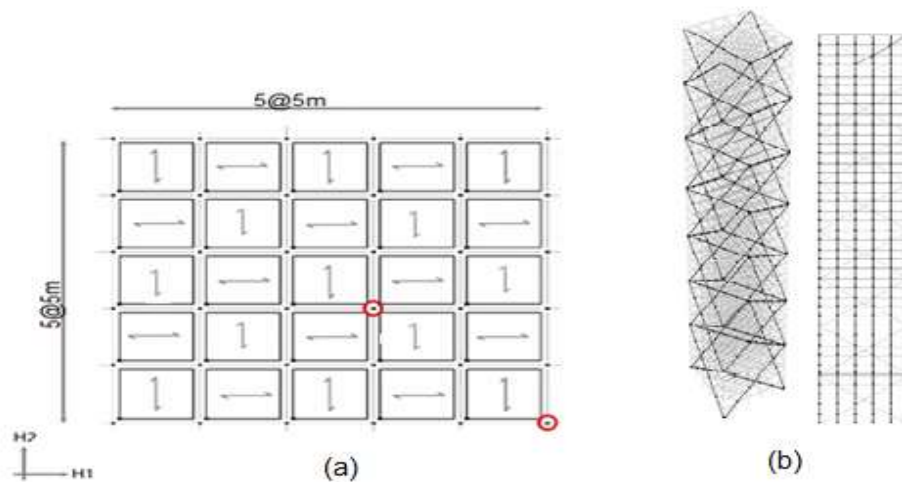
a) Plan and b) structure model of the buildings with 20, 40, 60 floors.
